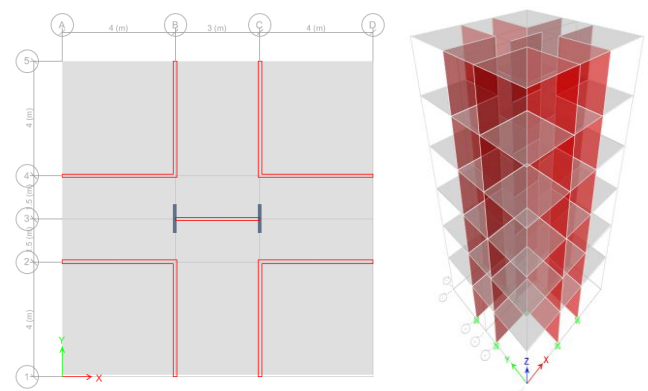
Plan and 3D view of the building (6 storey 120mm) without opening
